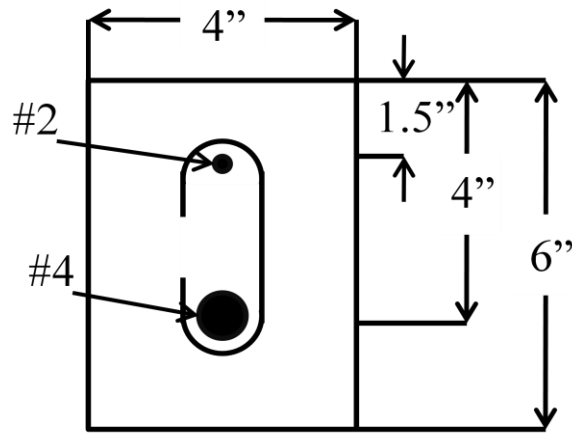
Reinforcing detail for concrete beam designed to fail in flexural bending
